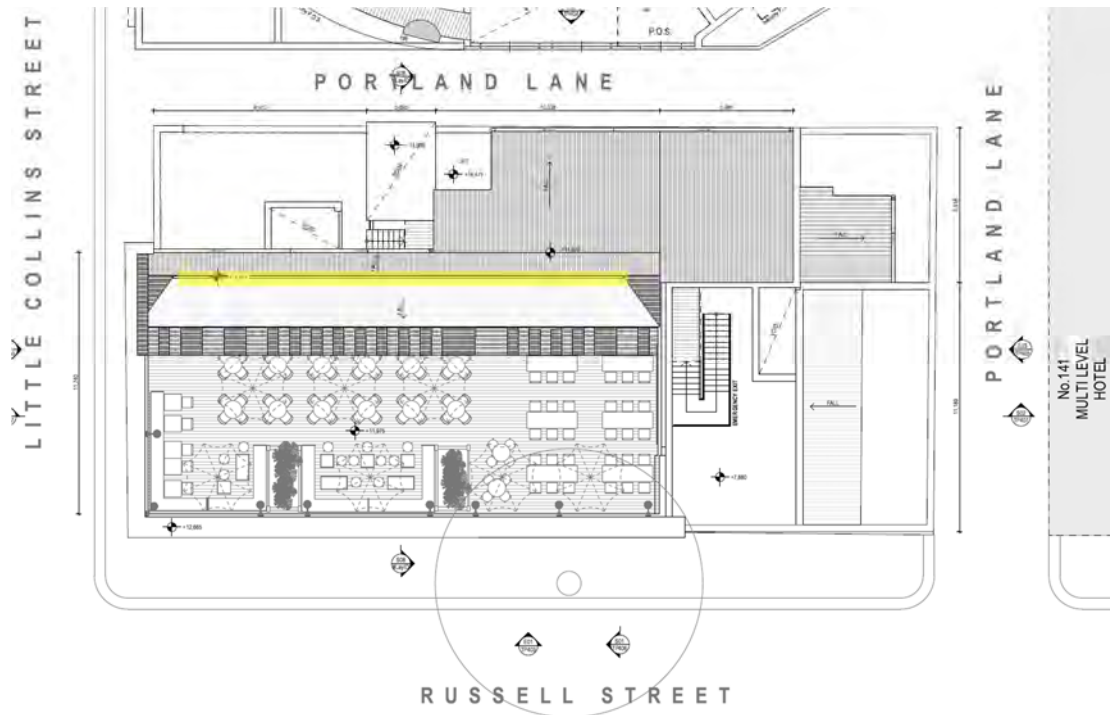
Roof plan including acoustic wall, highlighted in yellow (Source: Applicant)
